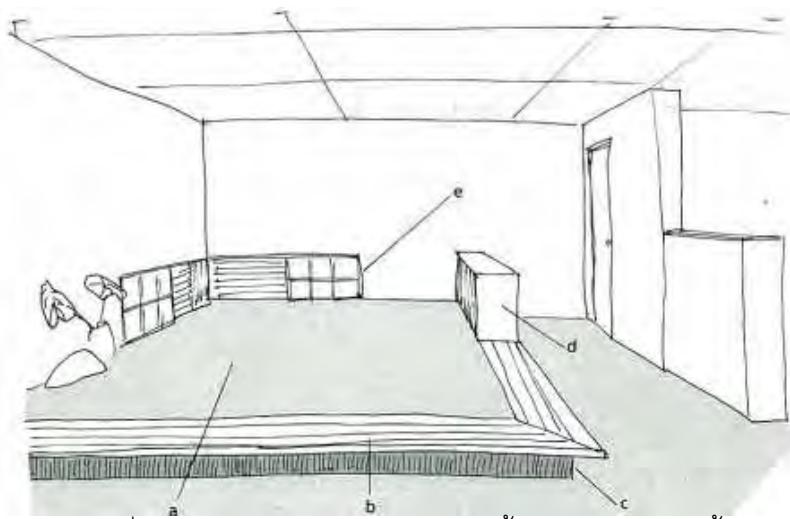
Cutaway plan: a) concrete slab foundation, b) floor raised on struts (Japanese construction), c) street-side access door for storage of long items, d) access hatches.
